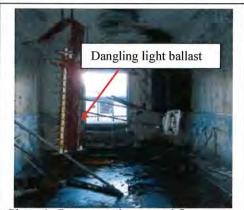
Representative ground floor room, Section C. October 22, 2014.
